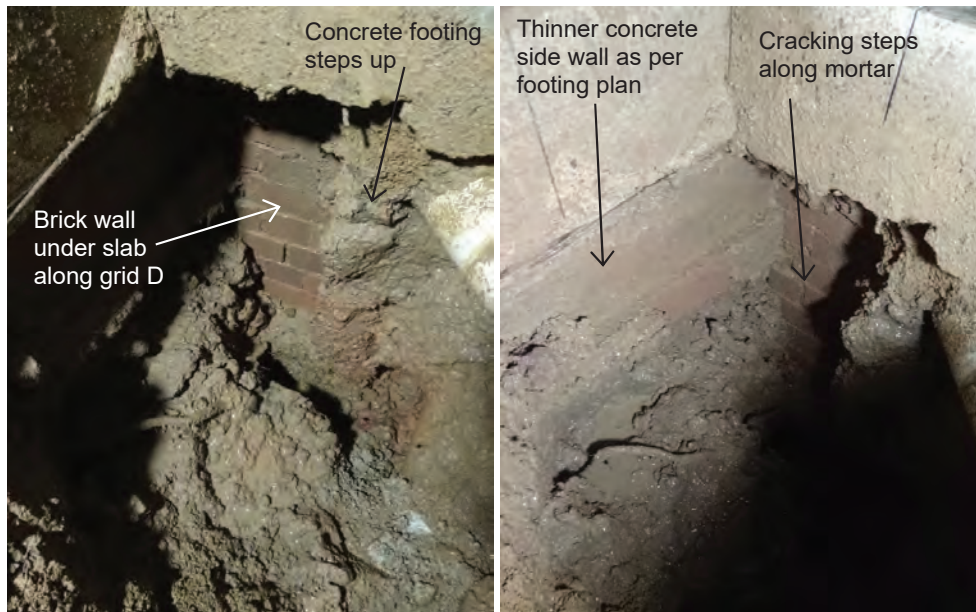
Sub floor wall and footing supporting Column at grid D:4.
